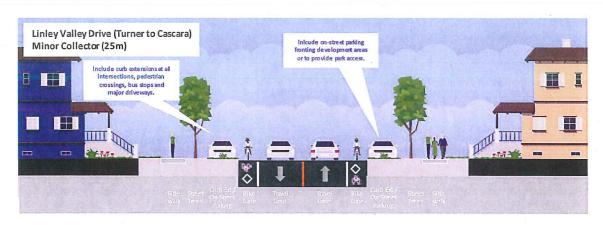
Recommended Typical Streetscape (Turner Road to Cascara Road)
